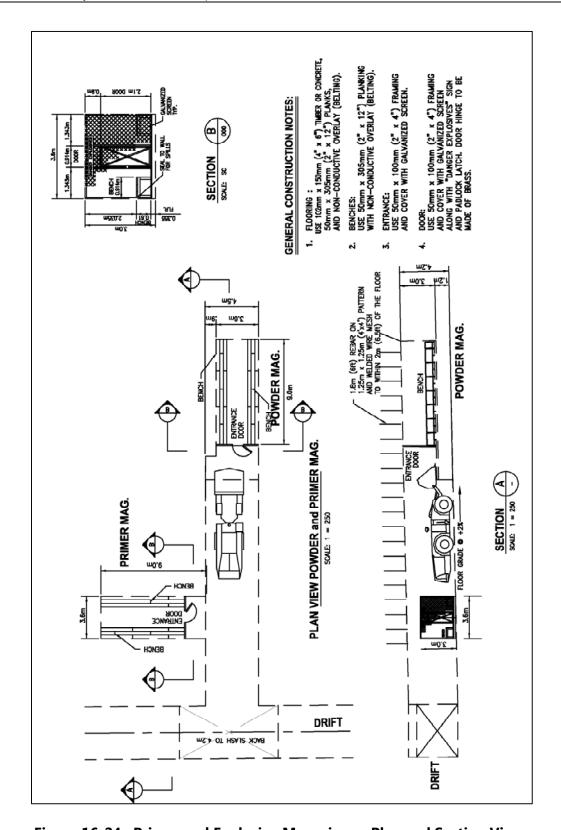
Primer and Explosive Magazines – Plan and Section Views
